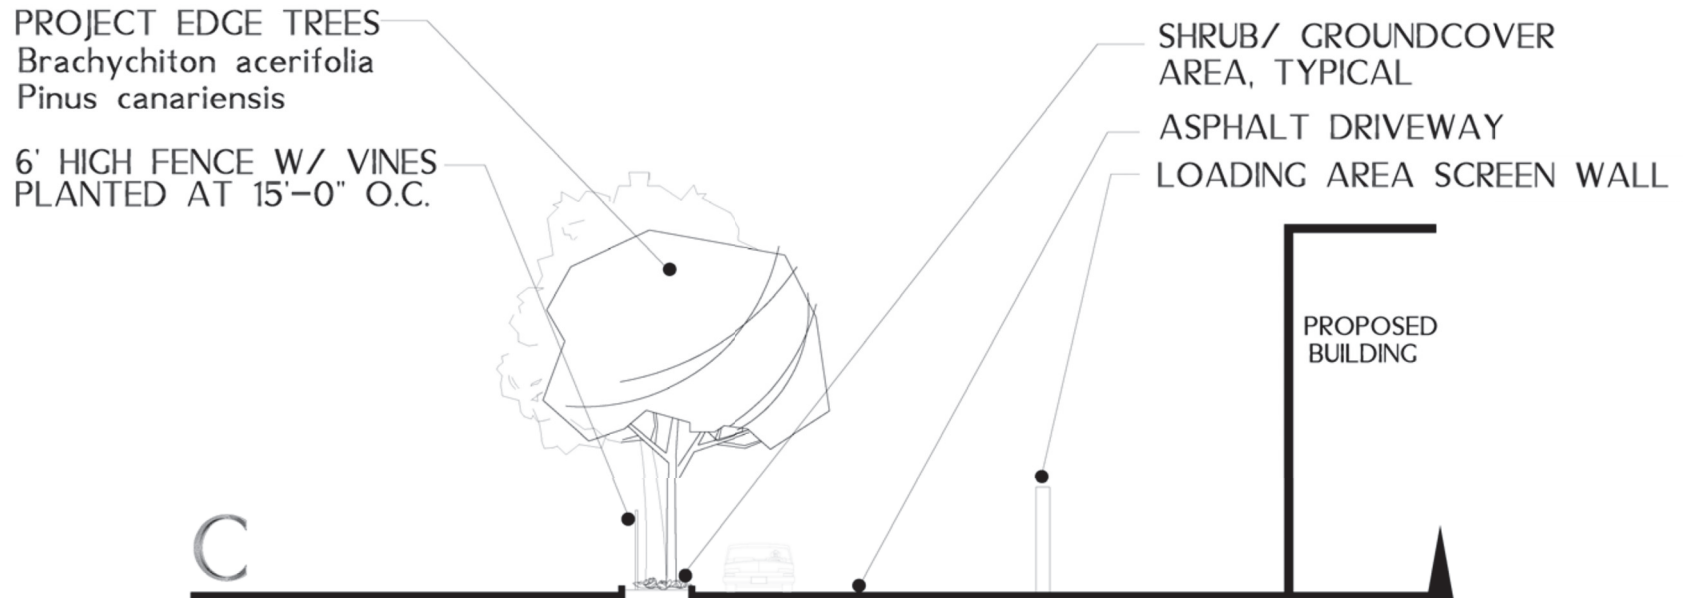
B LOADING AND STORAGE SECTION
